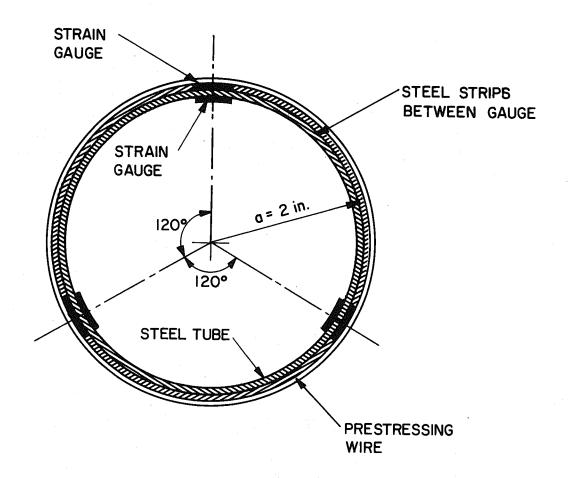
PROTECTION AGAINST PRESTRESSING WIRE OF STRAIN GAUGES PLACED ON OUTSIDE SURFACE OF THE STEEL TUBE
